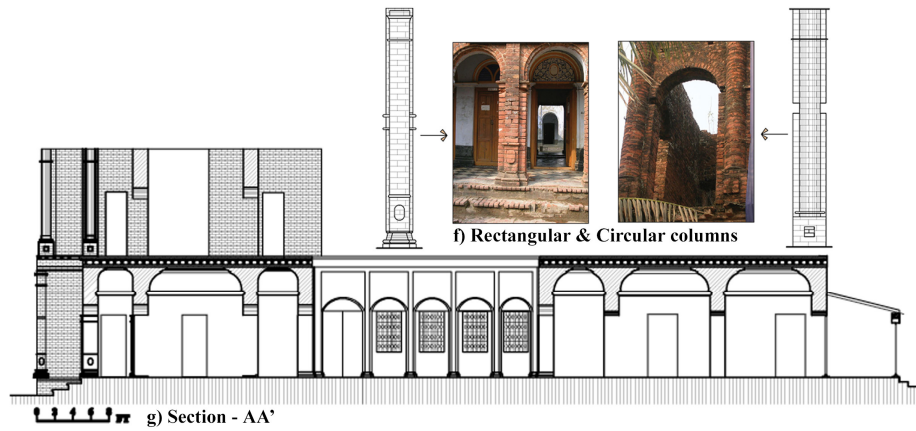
f) Rectangular and Circular Columns, and g) Section-AA' of the Building no. - 40.
